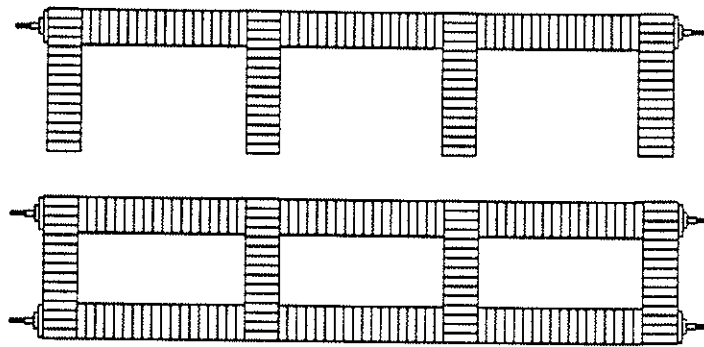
Stress-laminated T-beam Box-beam Bridge Schematics
